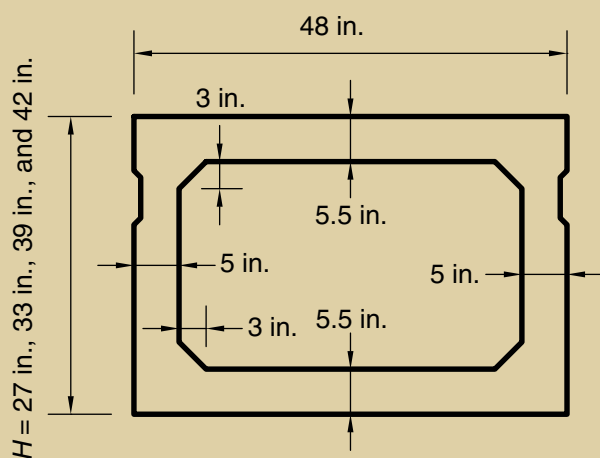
This drawing shows the American Association of State Highway and Transportation Officials' standard box girder used for developing the design charts currently available in the PCI *Precast Prestressed Concrete Bridge Design Manual*. Note: H = height of box girder. 1 in. = 25.4 mm.
